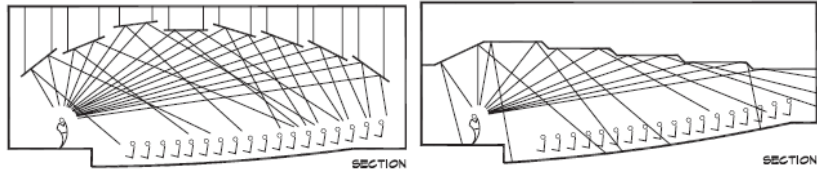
Reflected Sound from a Segmented Ceiling (left)-Stepped Flat Ceiling (right) [2, p:585]
